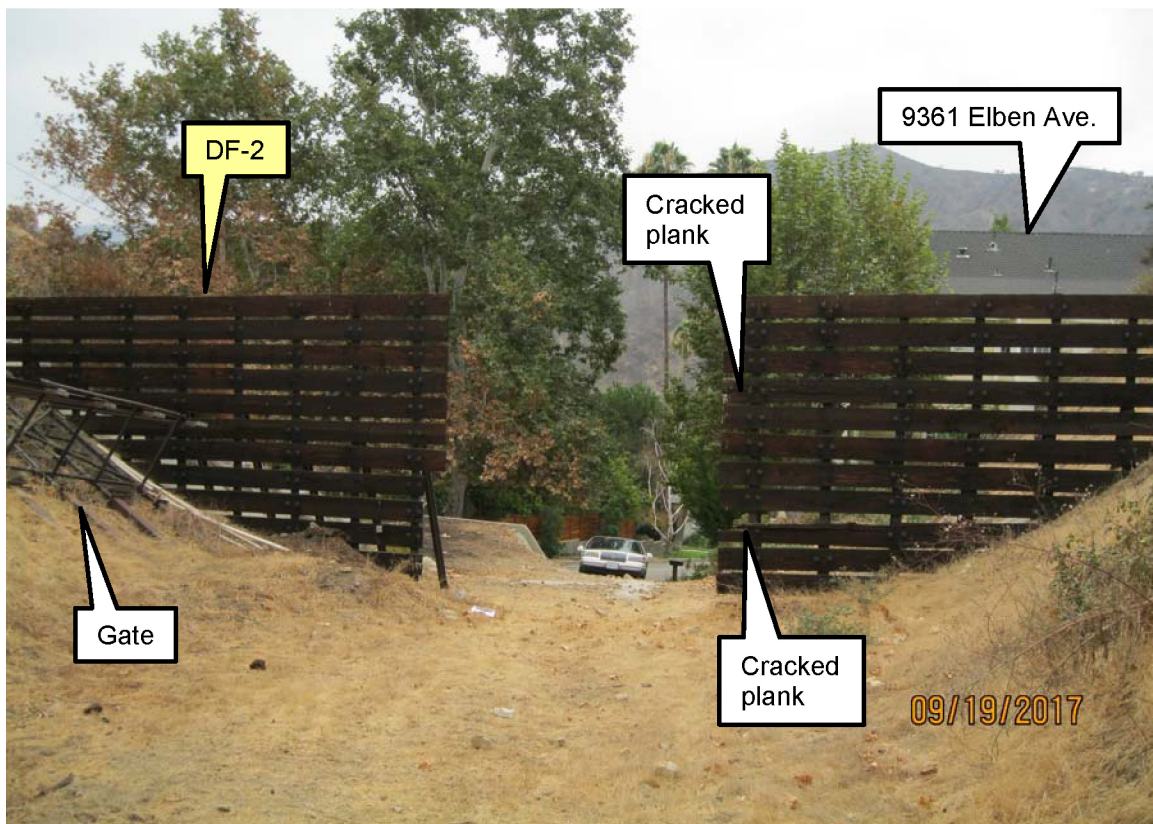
Standing upstream and looking toward DF-2 which is currently open. Note the gate leaning on the slope upstream of the fence. DF-2 was observed in good condition, with no fire damage and only a few cracked planks.
